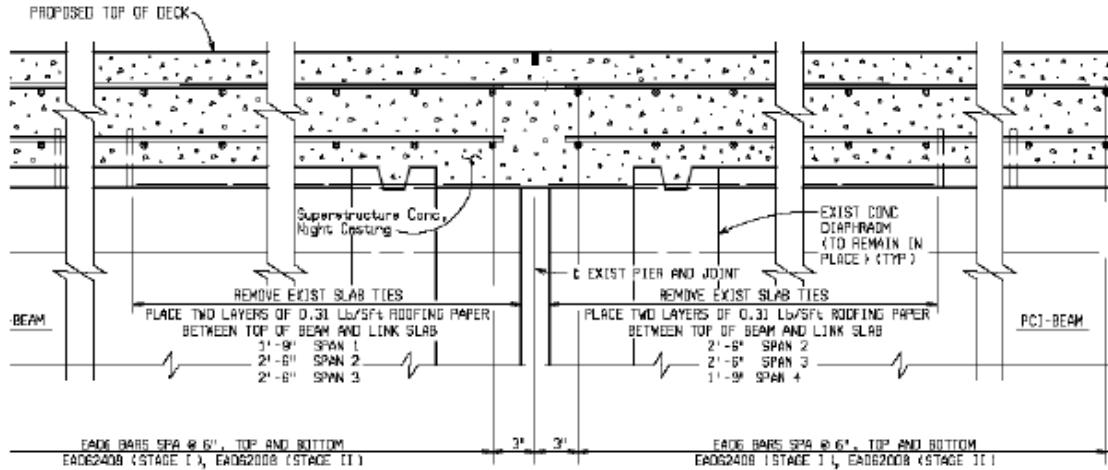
Link slab detail used in Michigan [Aktan et al., 2008]
